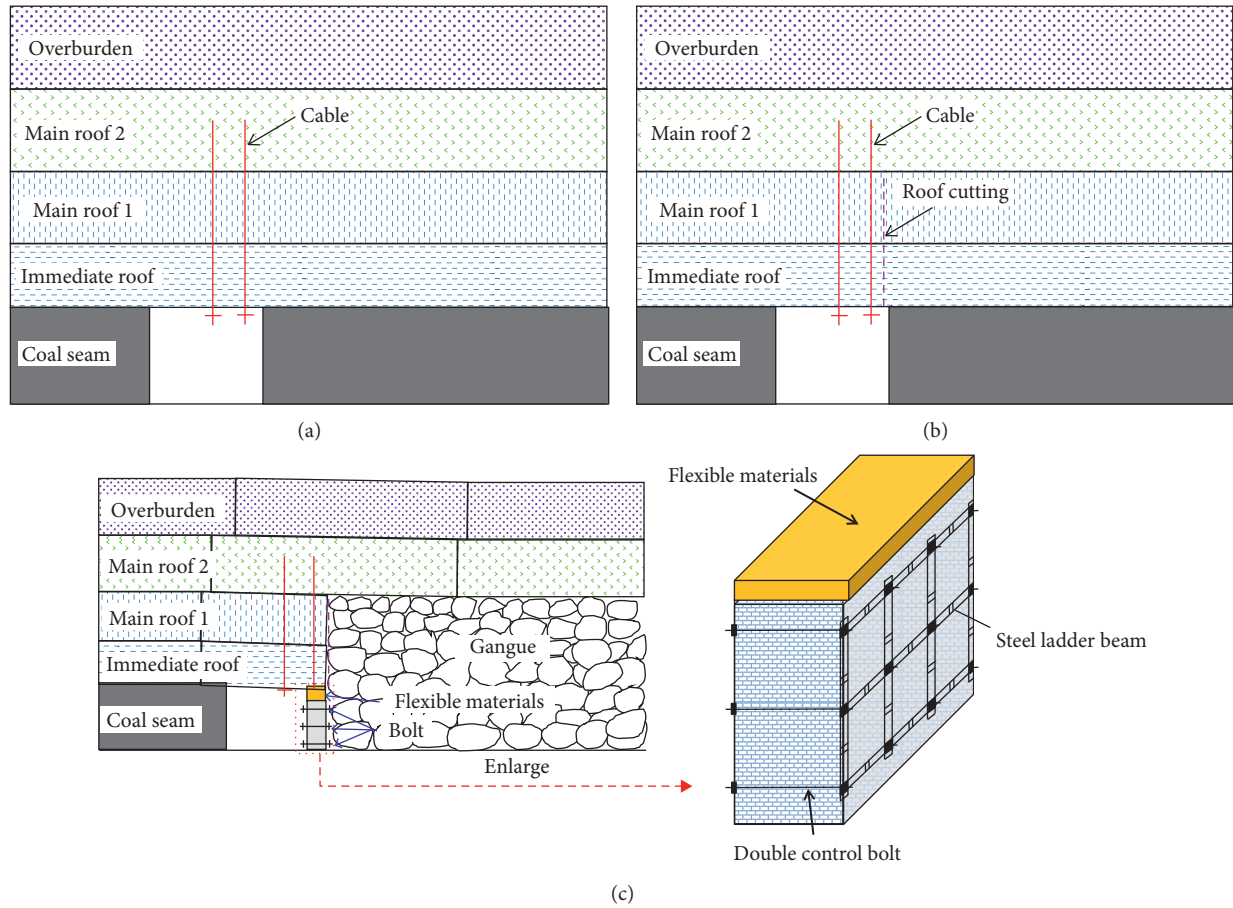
Technological processes. (a) Support: advanced reinforcement of roofs. (b) Cutting: pressure relief by roof cutting. (c) Protection: reinforcement of block walls.
